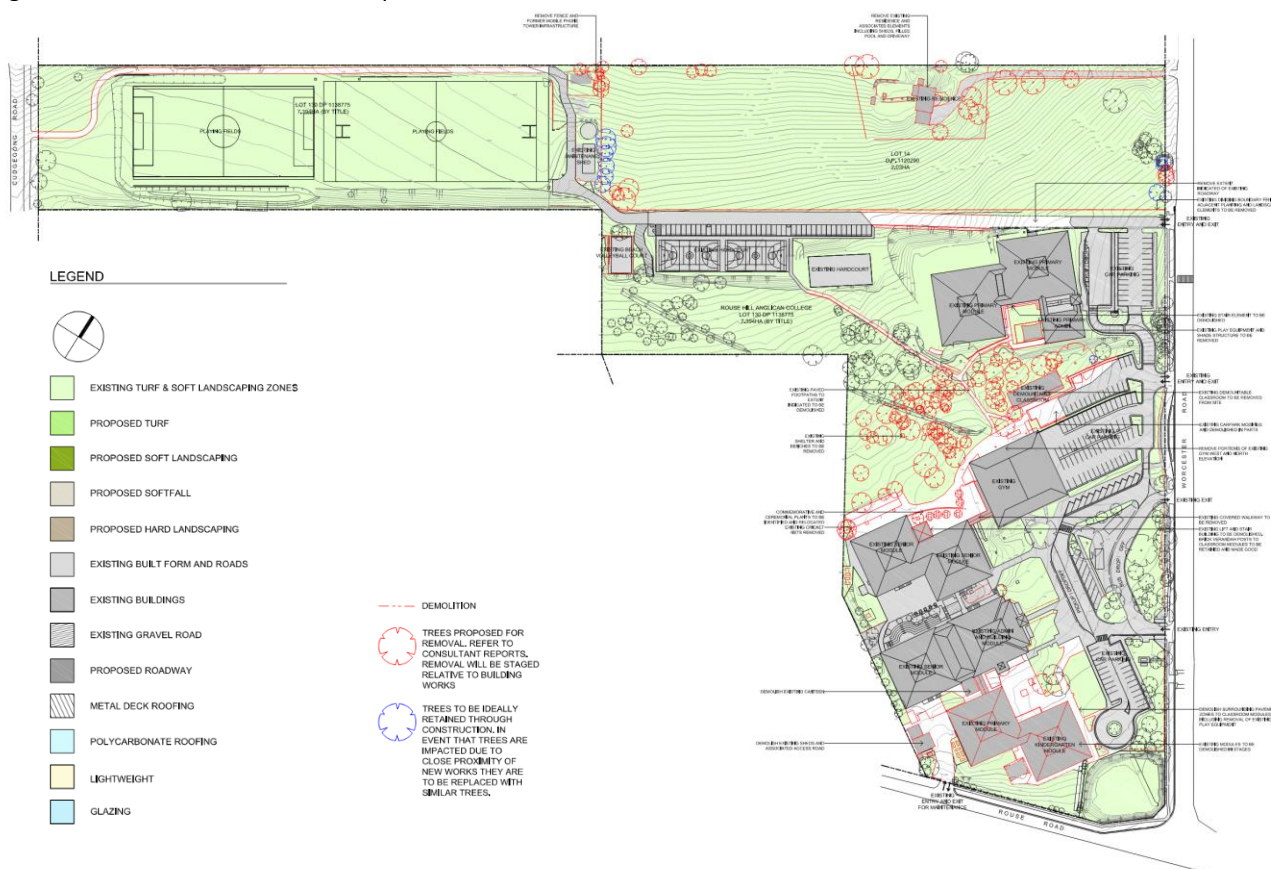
Site demolition plan showing demolition plan including some trees. (Terroir MP-00-02, 2015)
